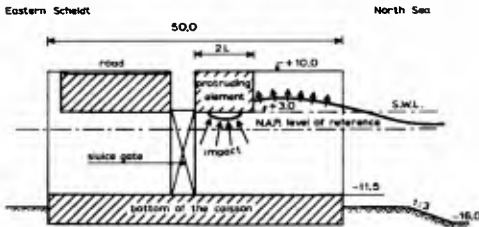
Typical caisson-section for the storm-surge barrier (design 1975)
